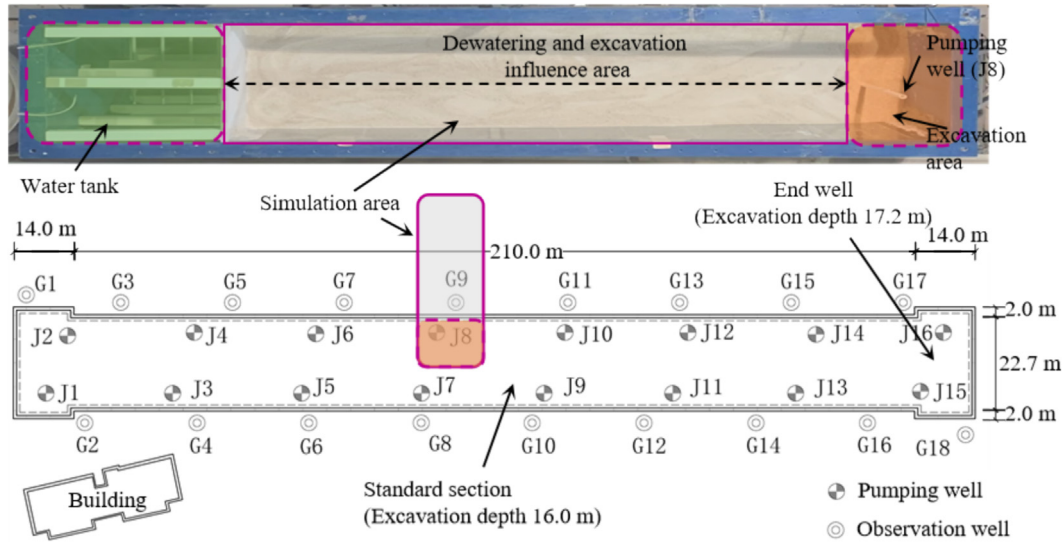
Plan view showing the simulated area of the subway station foundation pit.
